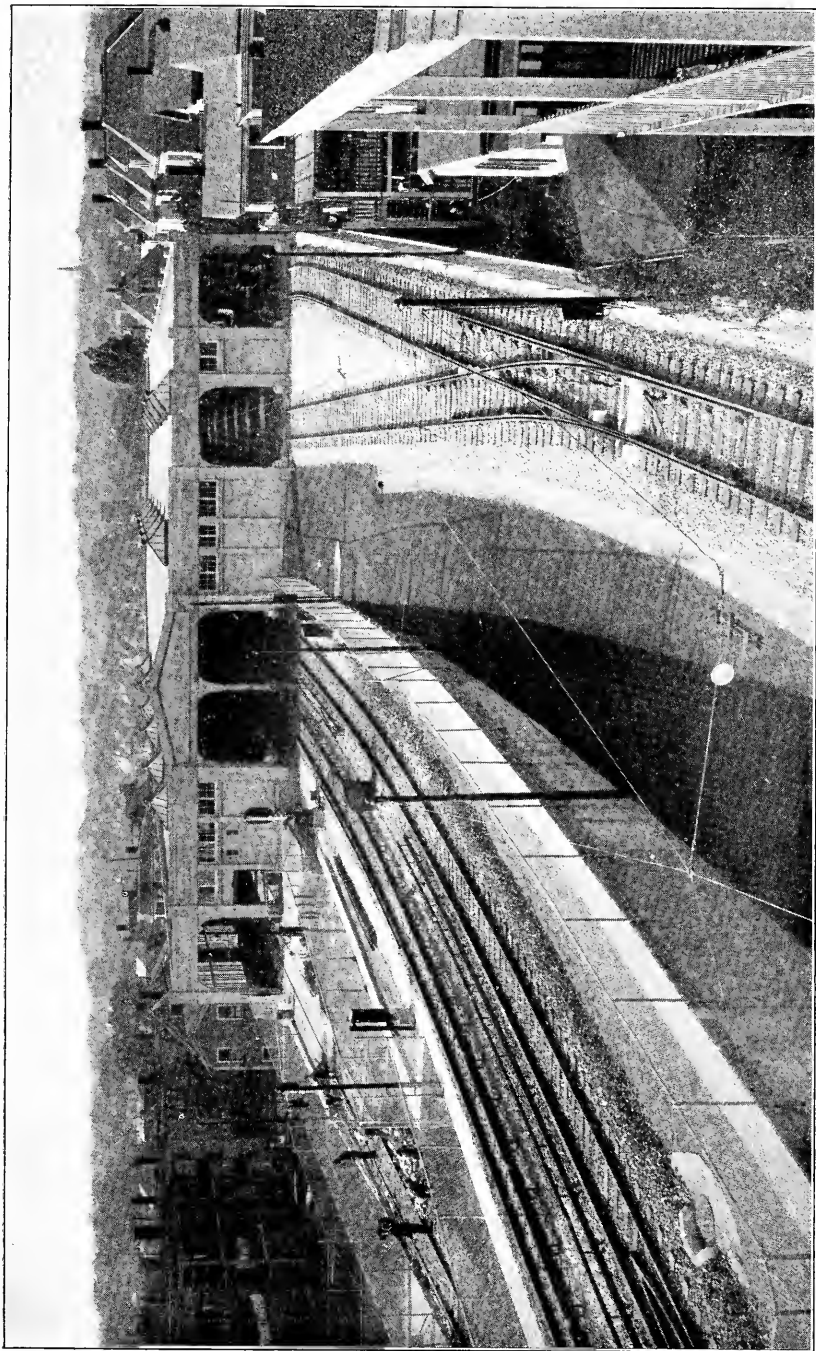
PLATE VII.—GENERAL VIEW FIELDS CORNER STATION, SHOWING THIRD RAIL TRACKS IN CENTER AND
